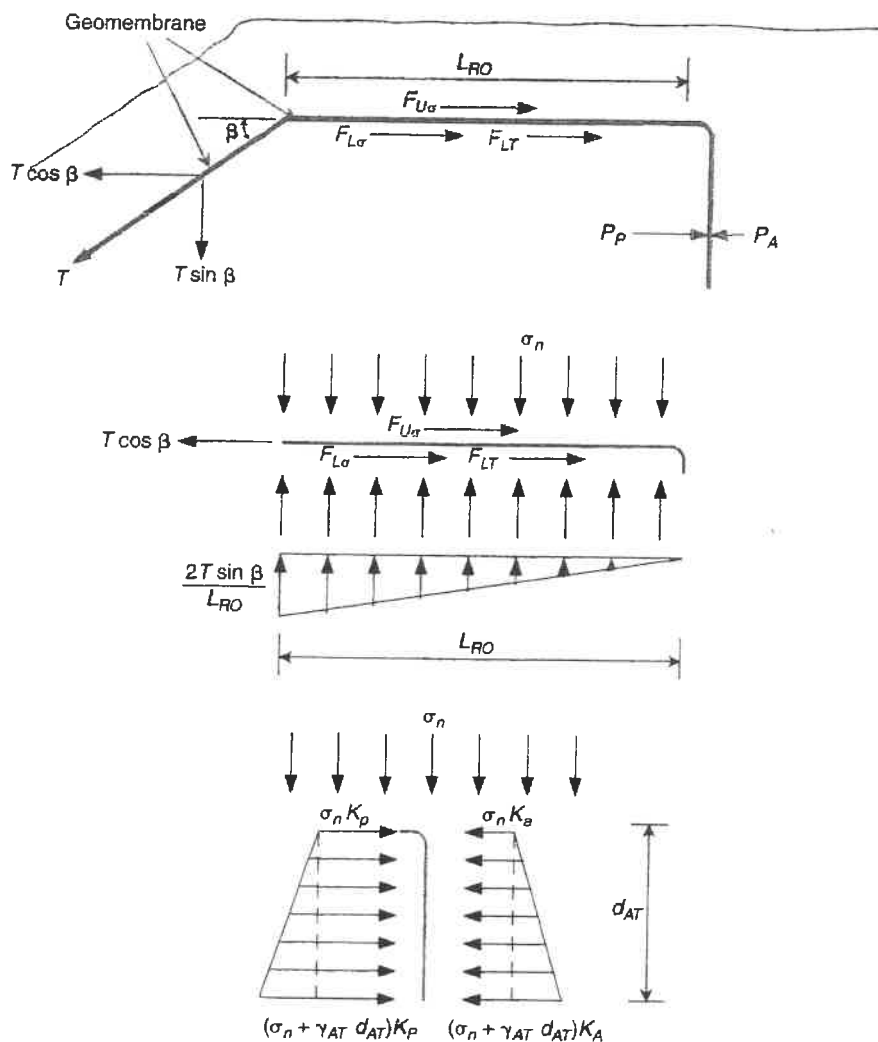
Cross section of geomembrane runout section with anchor trench and related stresses and forces involved.
